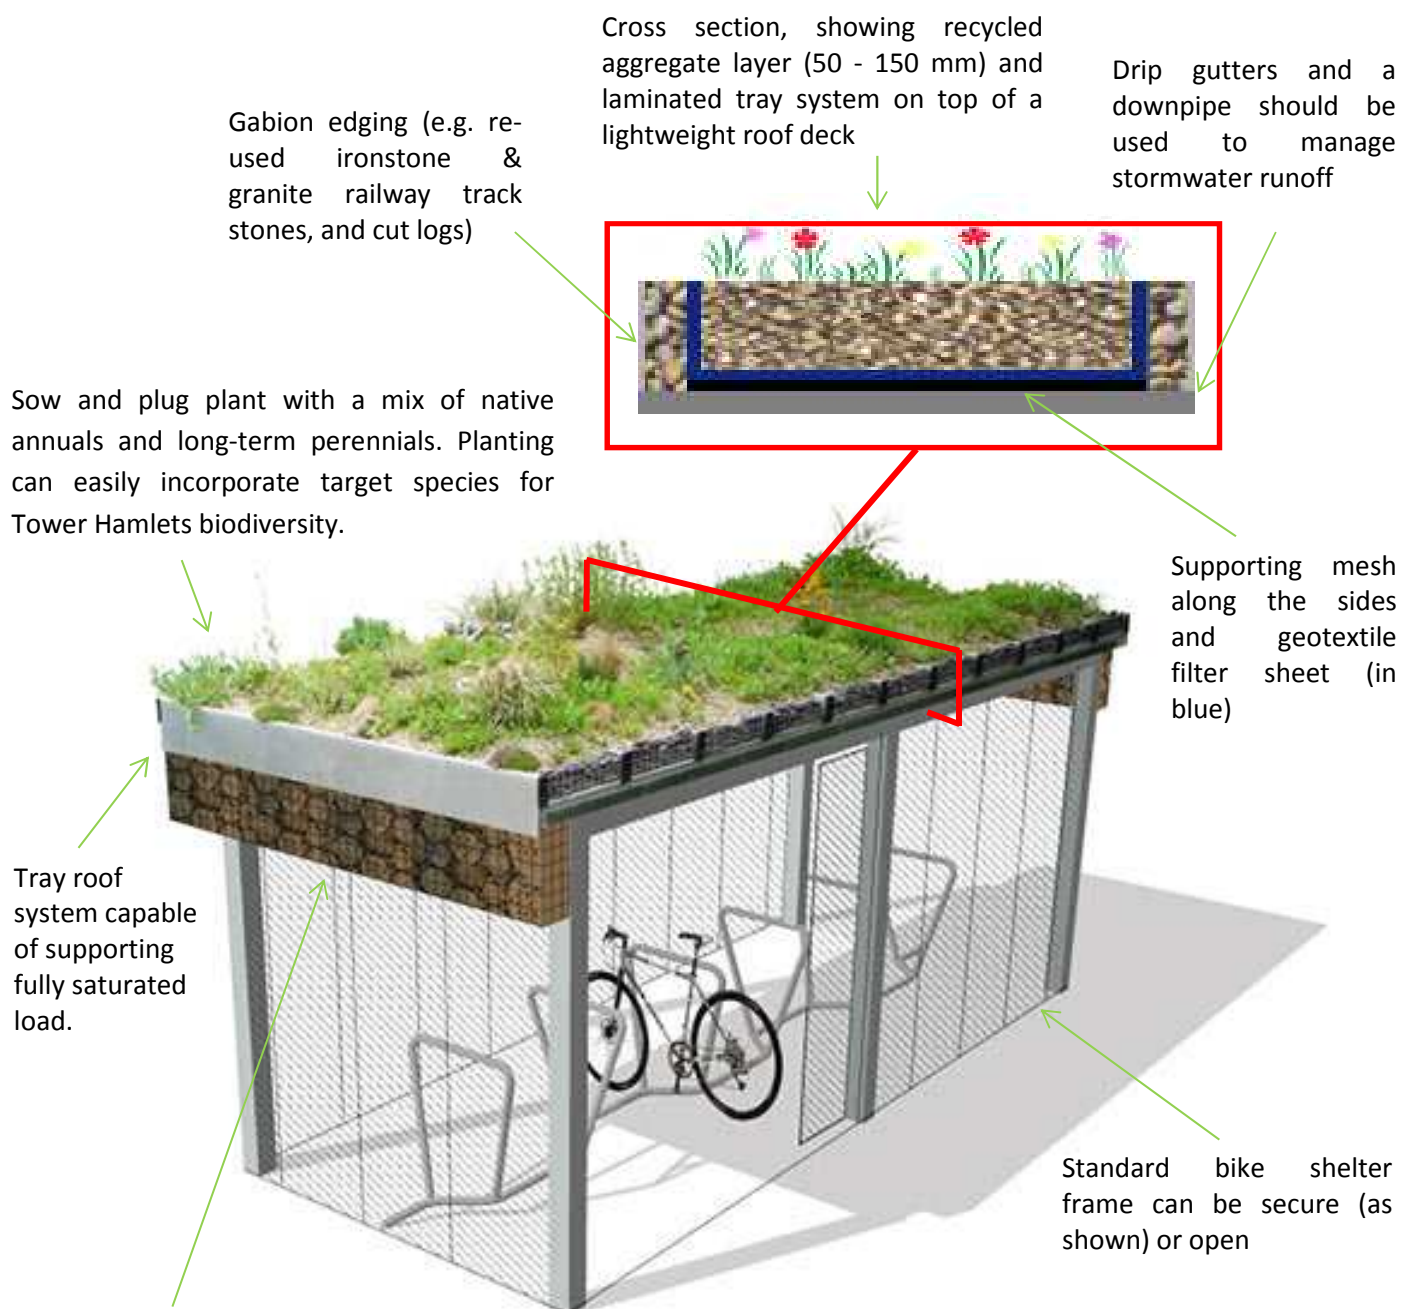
Green roof application on a bike shelter ©Green Roof Shelters
